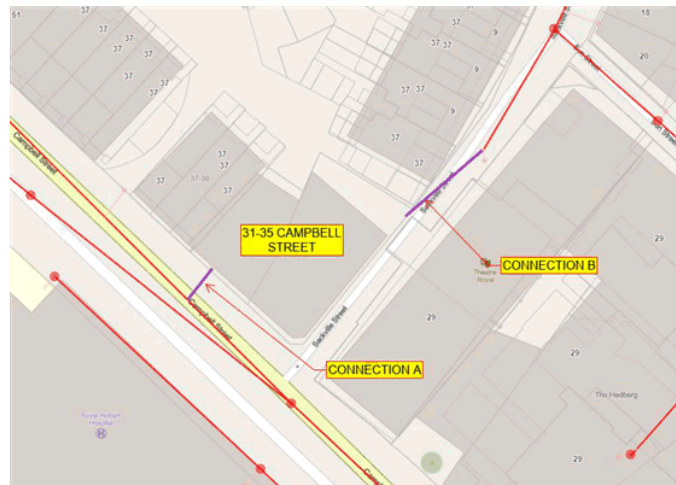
Existing TasWater sewer infrastructure and site sewer connections
